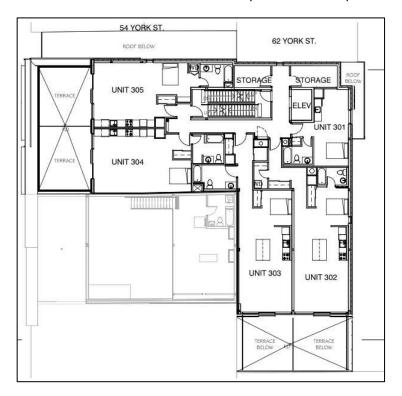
Exhibit E: Third Floor Plan of the Proposed Redevelopment.
